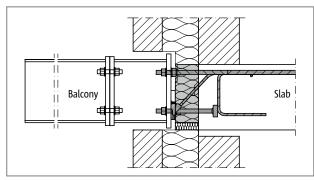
Schöck Isokorb® T type SK: Connecting the cantilever fin with on-site adapter; Isokorb® insulating element with optional additional insulating
